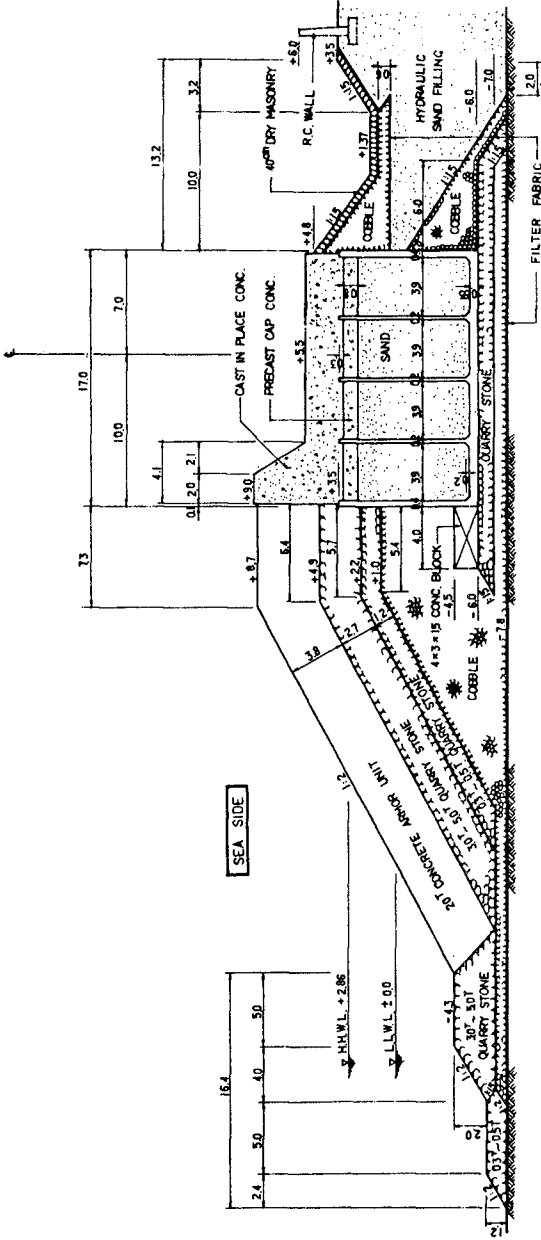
Typical Cross Section of Seawall/Breakwater (composite caisson type)
